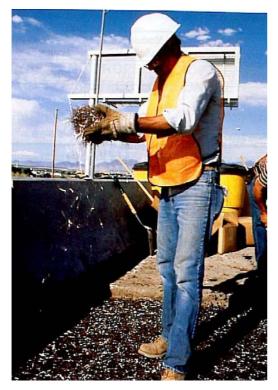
Placing of steel fibres before cement slurry is added in order to produce slurry infiltrated steel fibre concrete (ACI 544.1R-96 1997).
